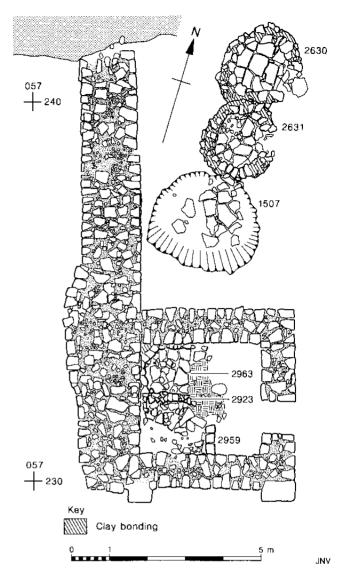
North tower of porta principalis sinistra, showing hearth, and ovens set in the rampart to the north
